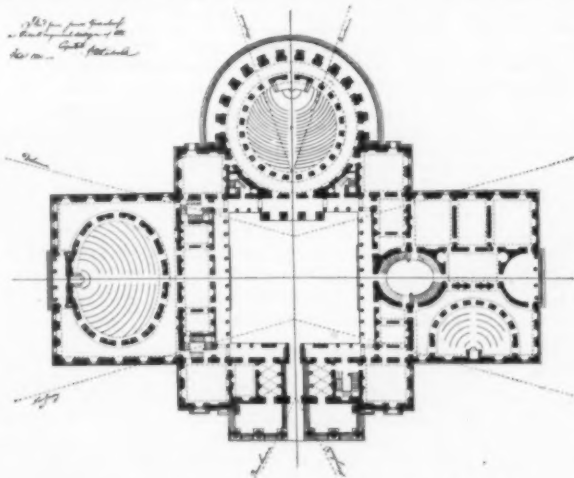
Hallet's Effort to Change Thornton's Plan. [C. L. S.]
